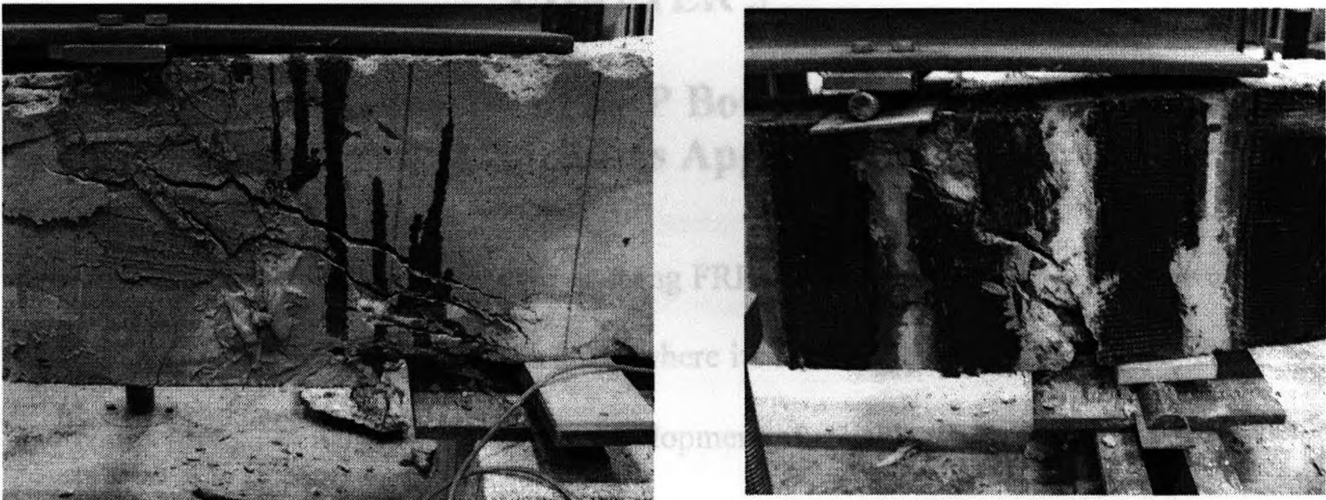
Typical shear strengthening details used in, (a) B-I-CR1, and (b) B-I-CR1 shear specimen.
